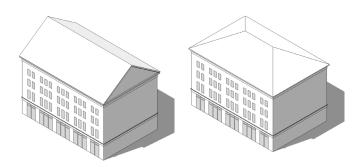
G.2.a.i: Gabled roof (left); Hipped roof (right)
